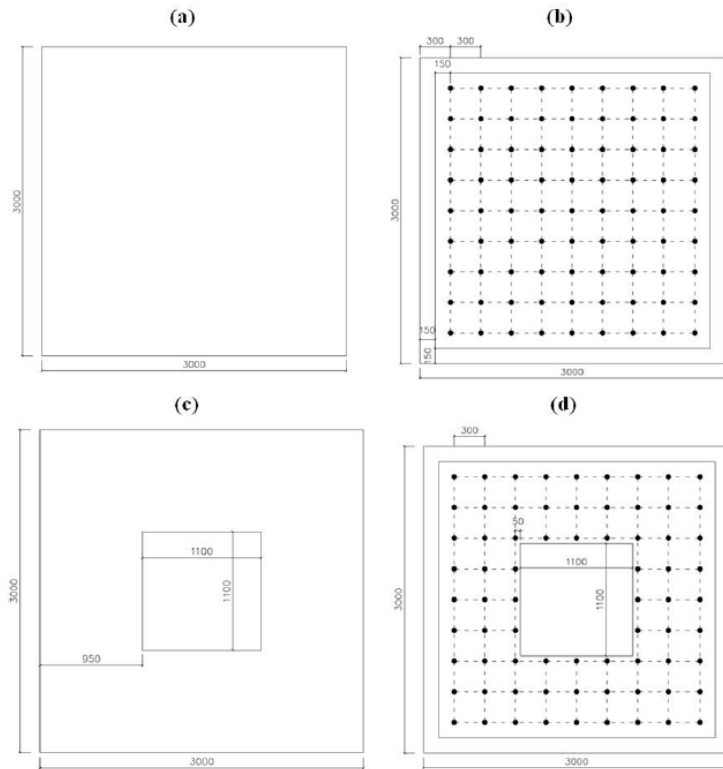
FE model details: a) steel shear wall without opening, b) Composite shear wall without opening, c) steel shear wall containing opening, d) Composite shear wall containing opening (Arabzadeh et al. 2017)
